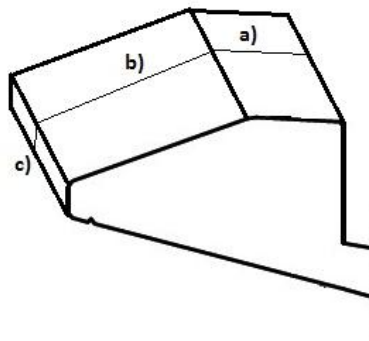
Crack location on edge beam. a) Top, b) Middle, c) Side.
